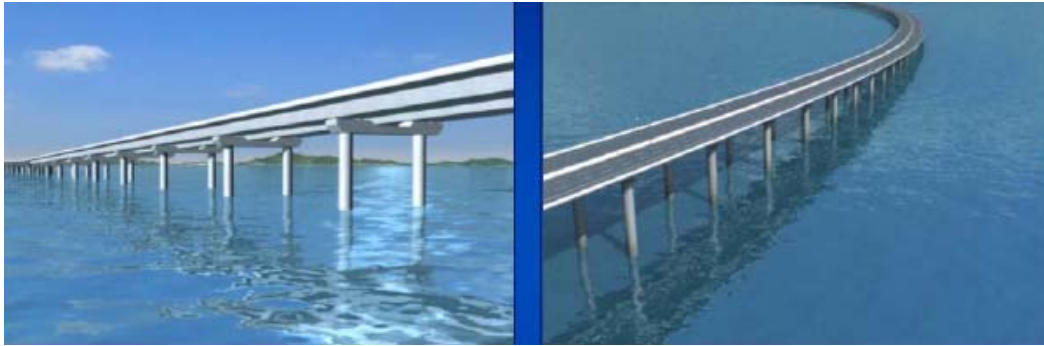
Viaduct bridge/5,950m (West Bridge)/2,450m (East Bridge)
